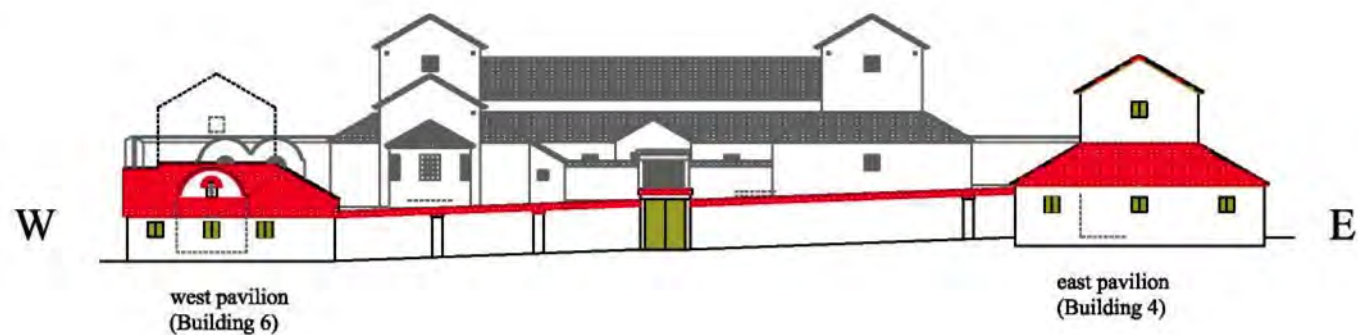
Minster Roman villa – suggested south elevation, with pavilions.
